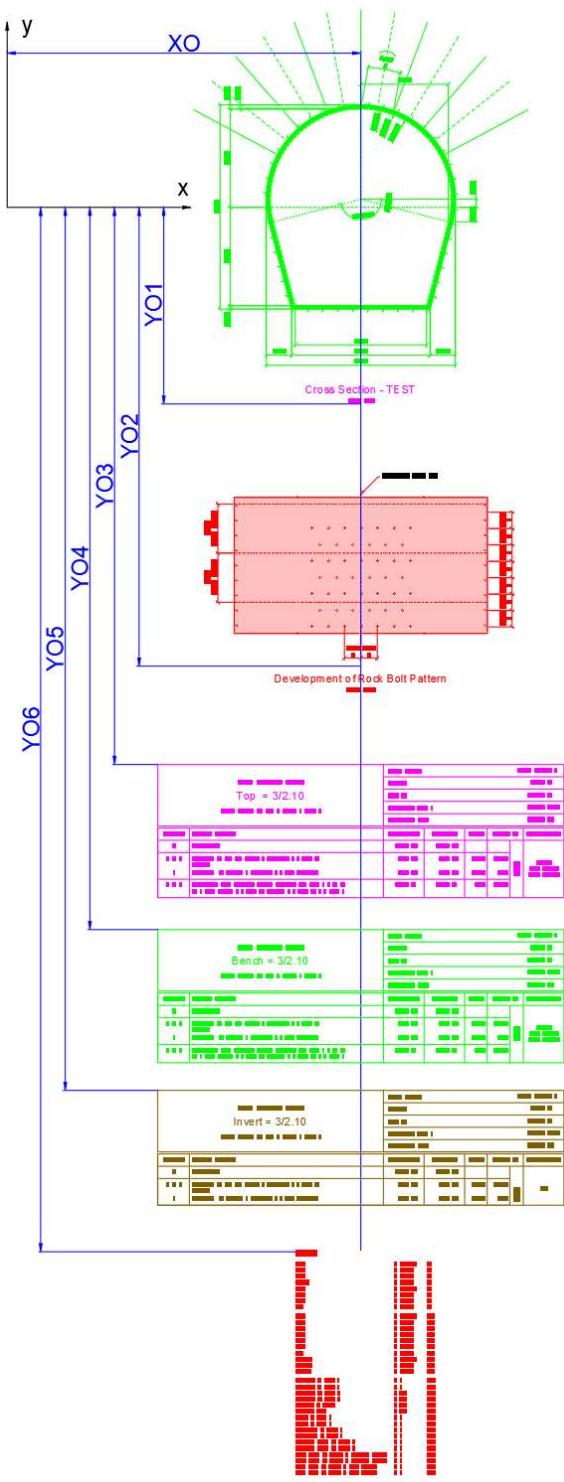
AUSTRIA ADD-ON layout (separated table style)
